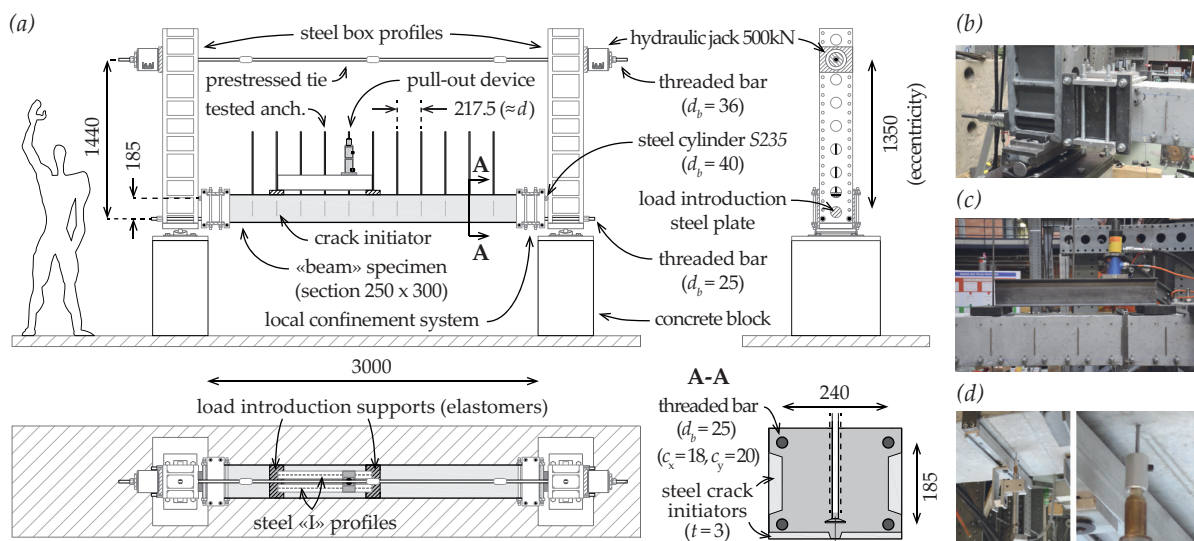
Test setup for the anchorages tested in flexural cracks (concrete specimen under bending solicitation): (a) detailed plans and description (dimensions in [mm]); (b) local confinement system; (c) pull-out device; and (d) measurement details of the slip
